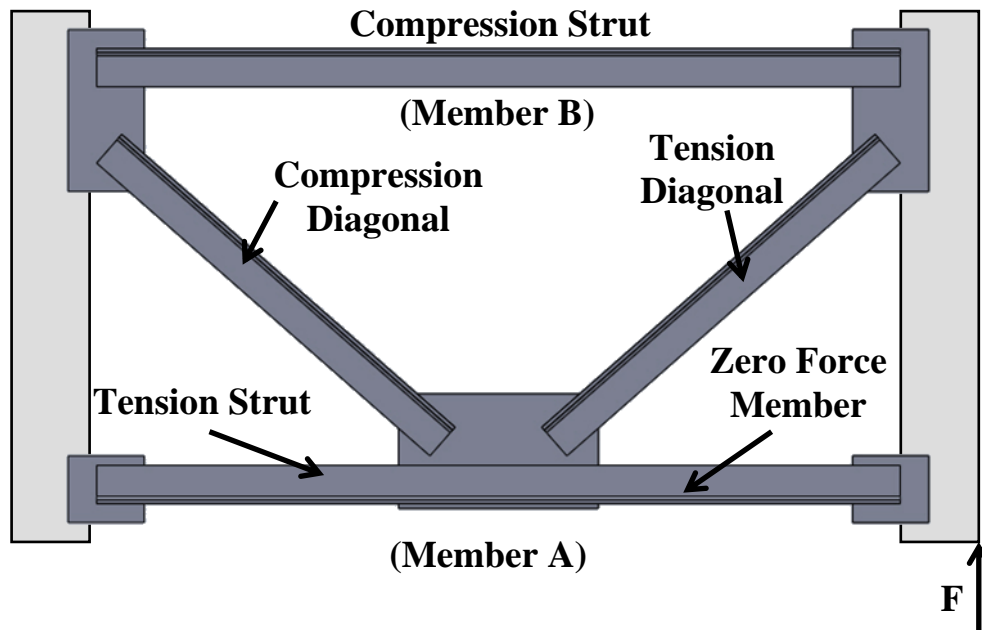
Typical K Frame Internal Forces from Load Applied
